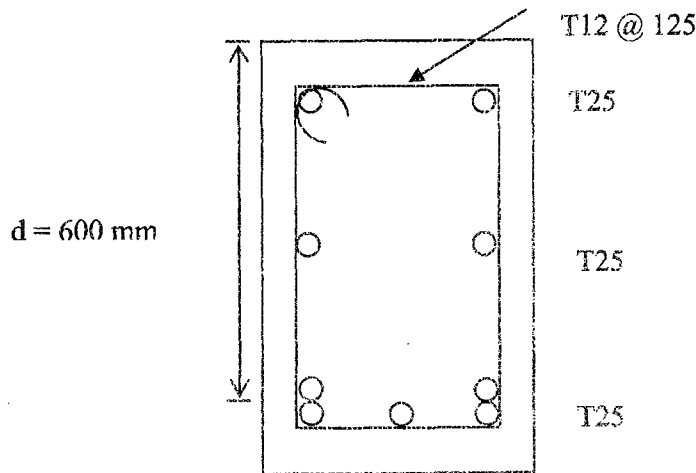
Rectangular cross section beam (300 mm x 700 mm)
